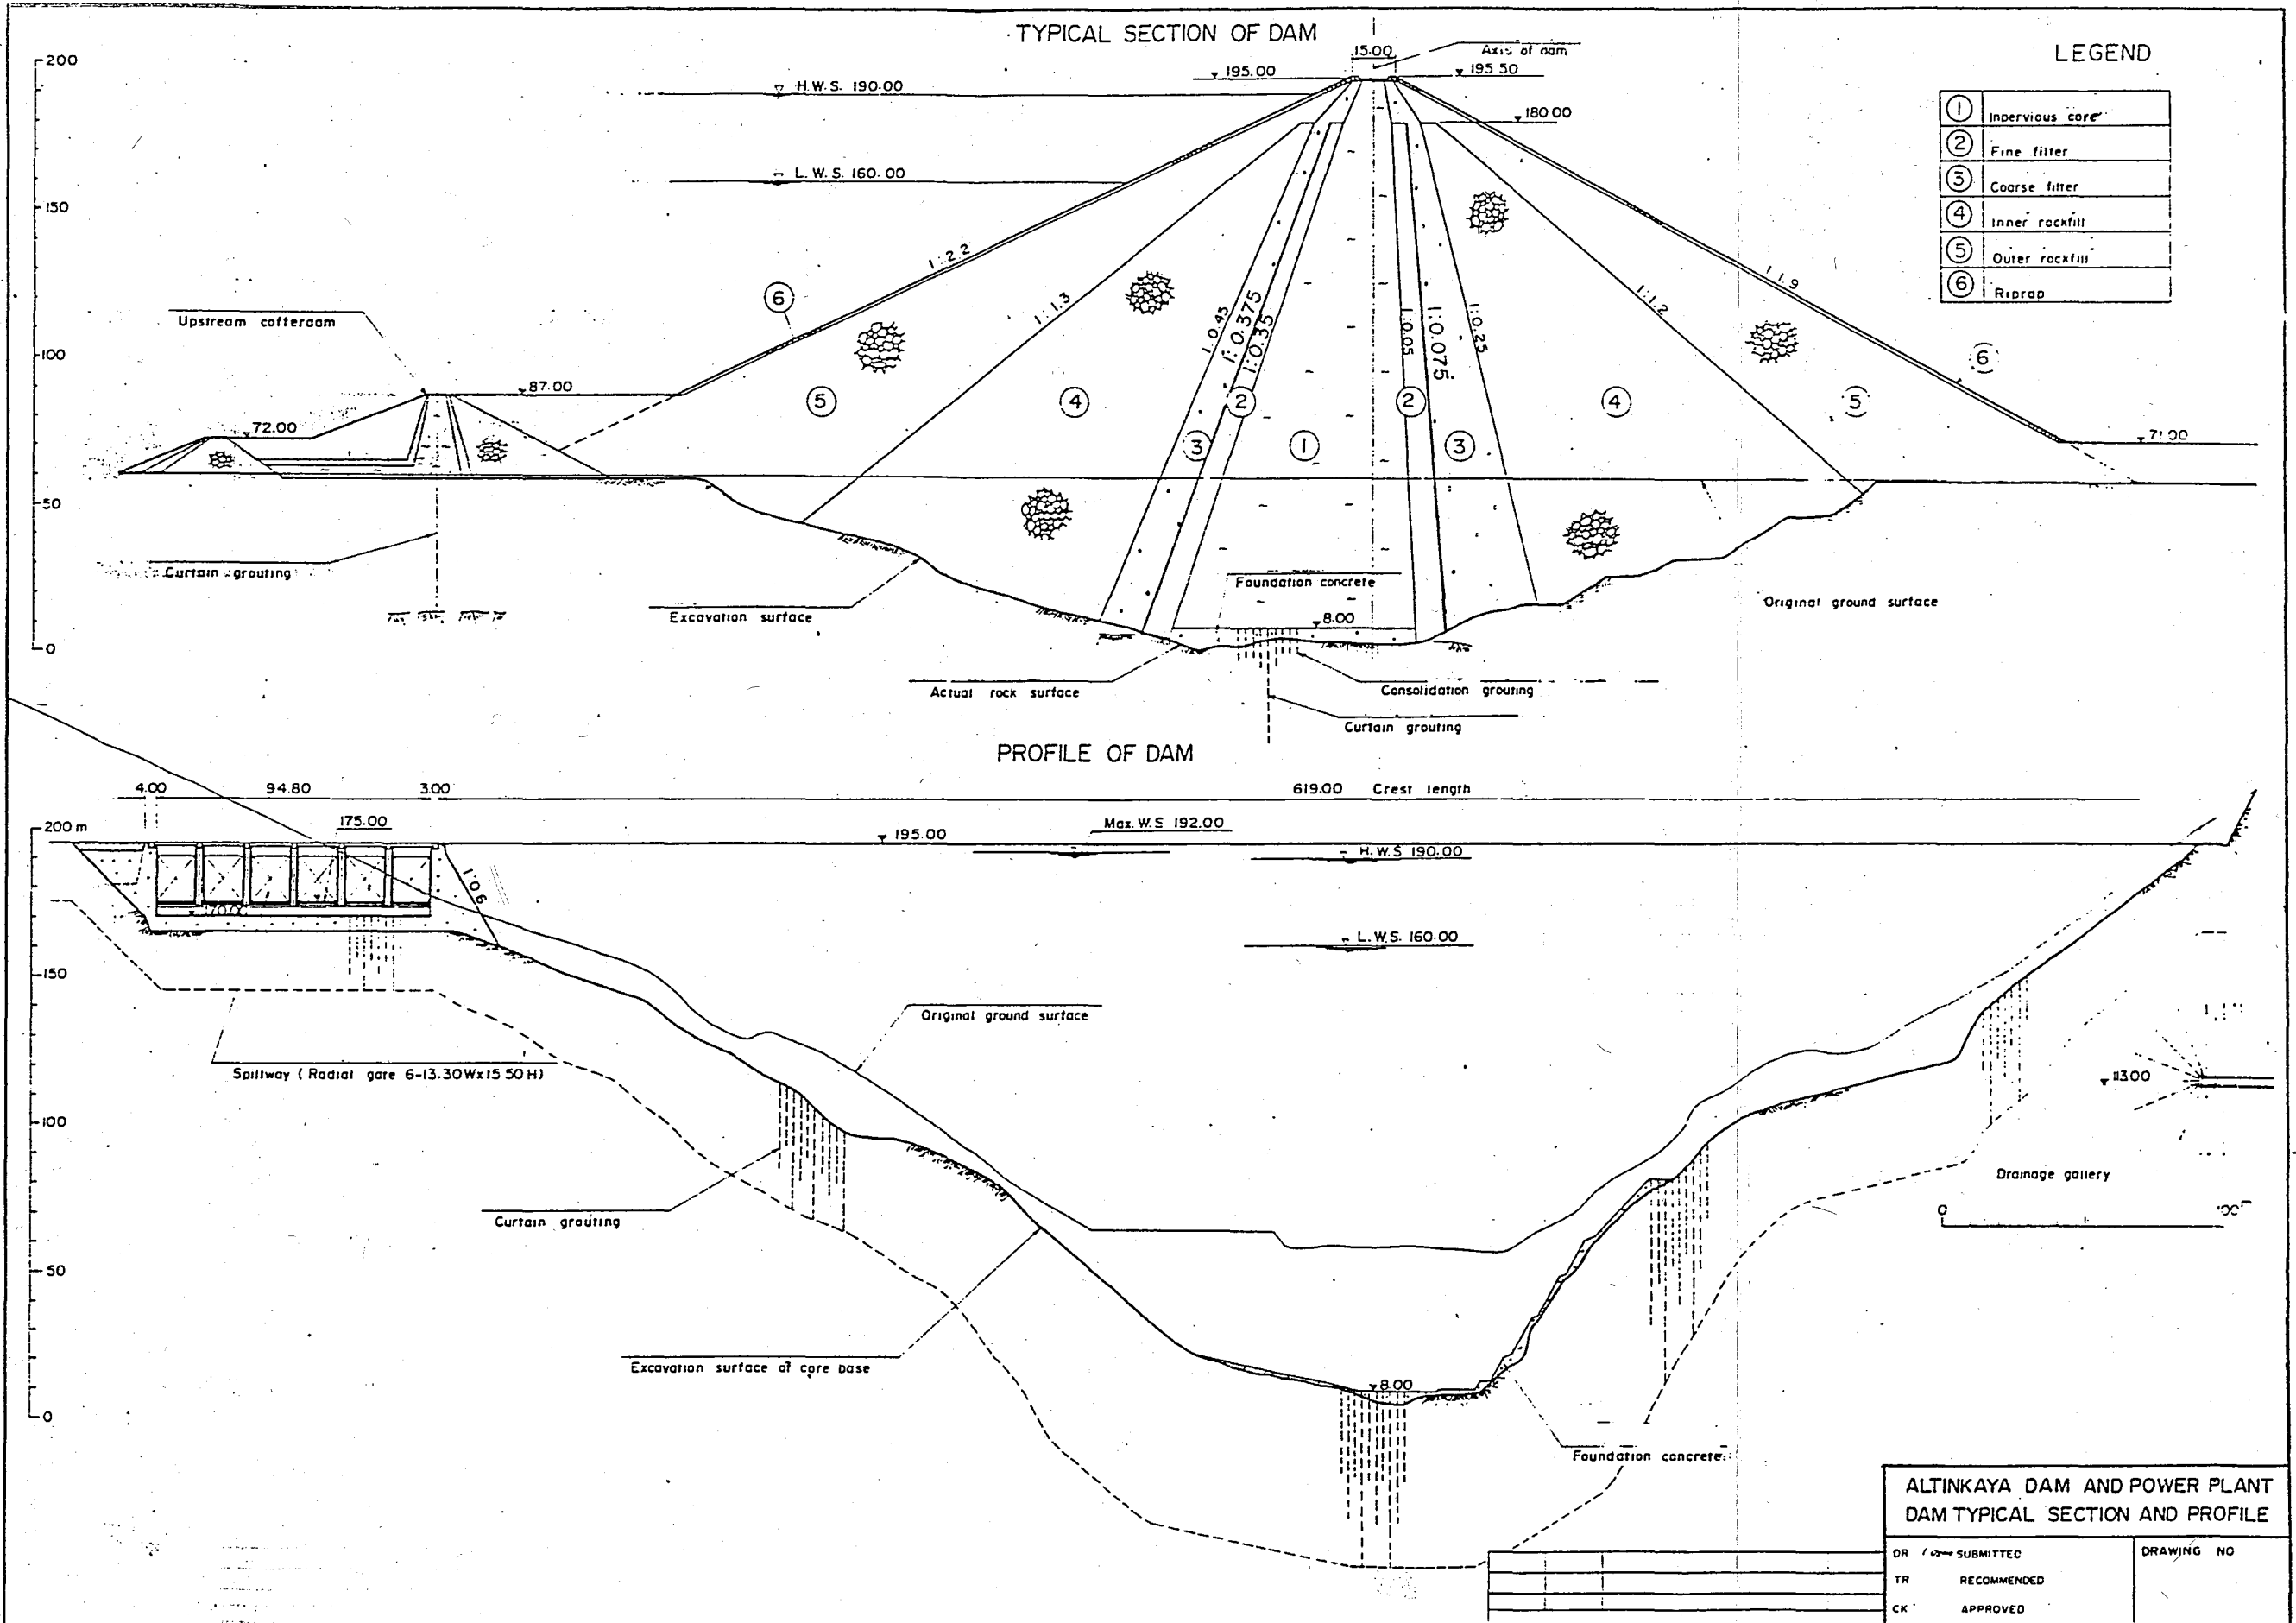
Typical Design Section and Profile of Altinkaya Dam
